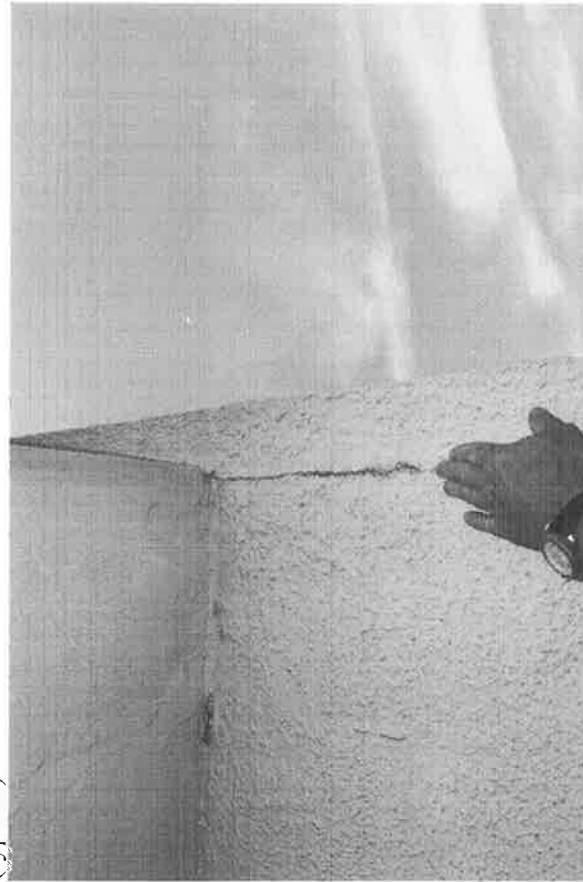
Isolated crack along previously repaired area of CMU wall (typical)
